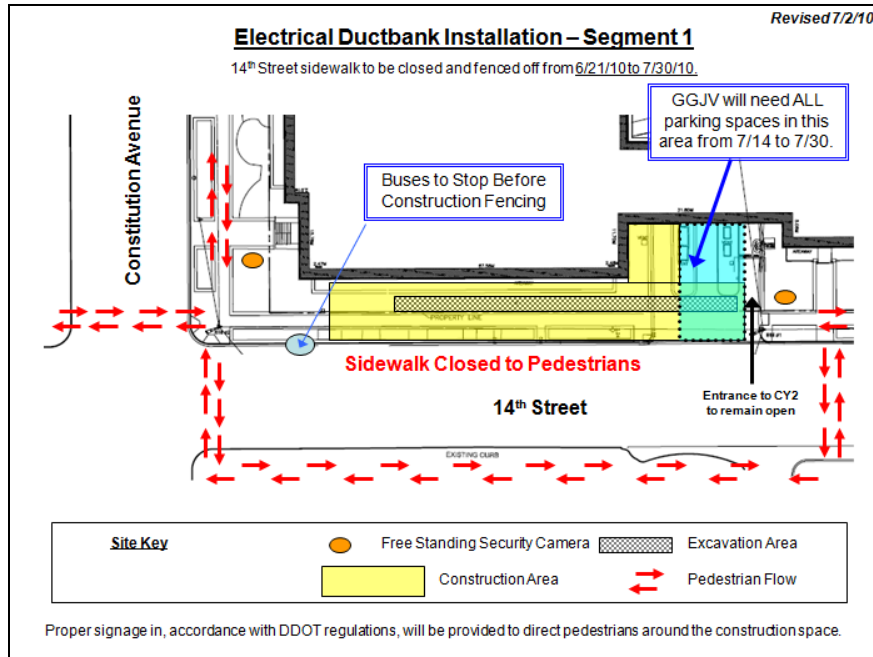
portrays just one example of a tenant impact plan for pedestrian traffic on the Office Renovation Building project. Many of these plans were created with the building's facility manager to help communicate such impacts to building occupants.
